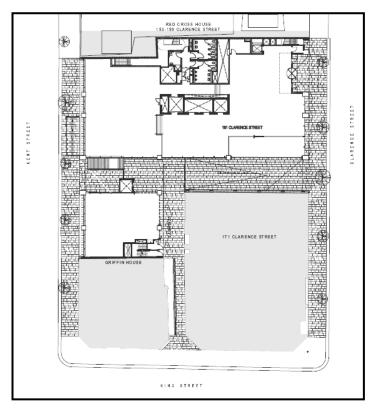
Plan illustrating the proposed through-site link connection with the existing laneway
